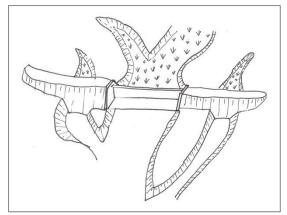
One large weir with earth banks controlling the slope of three streams
